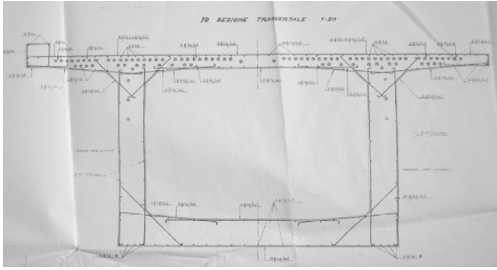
Transversal section of the girder in correspondence of the pier, as per the *original* technical drawings. Note the “historical” reinforcement: the transversal one is made with stirrup 10 mm in diameters spaced at 200 mm, also the anchoring of the bars has a short length but shows a partial hook.
